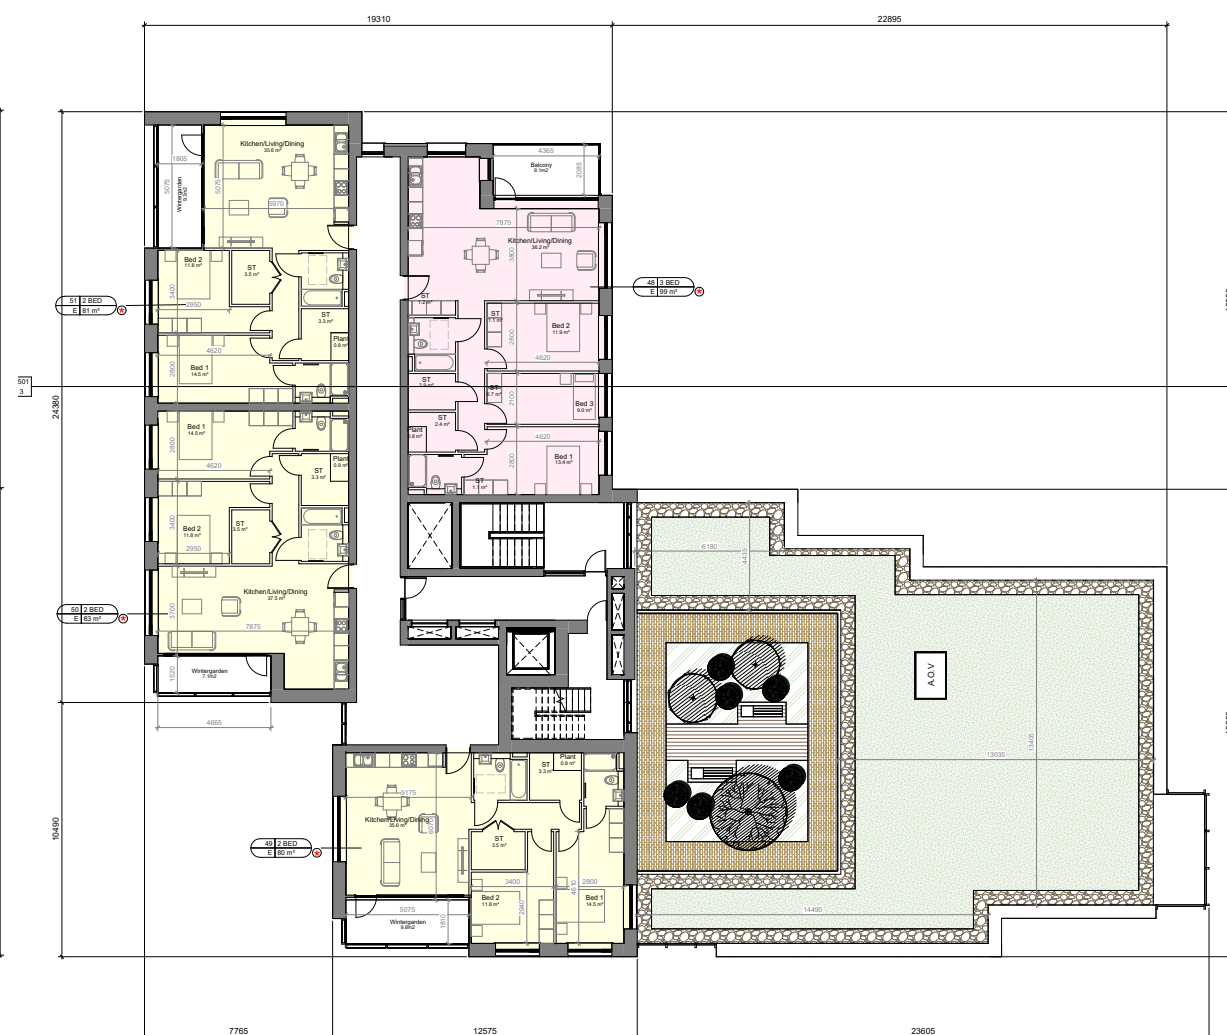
Block E- Seventh-Eighth Floor Plan Source: MCORM, 2026.
